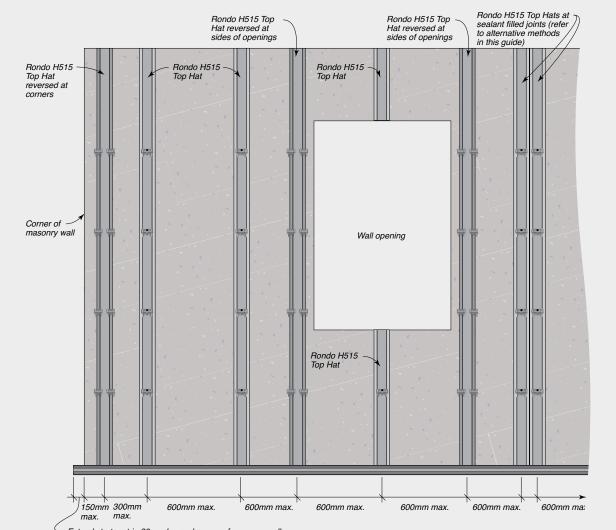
Typical Territory System Cross Sectional Detail for Masonry substrate where face fixing is required – Elevation
